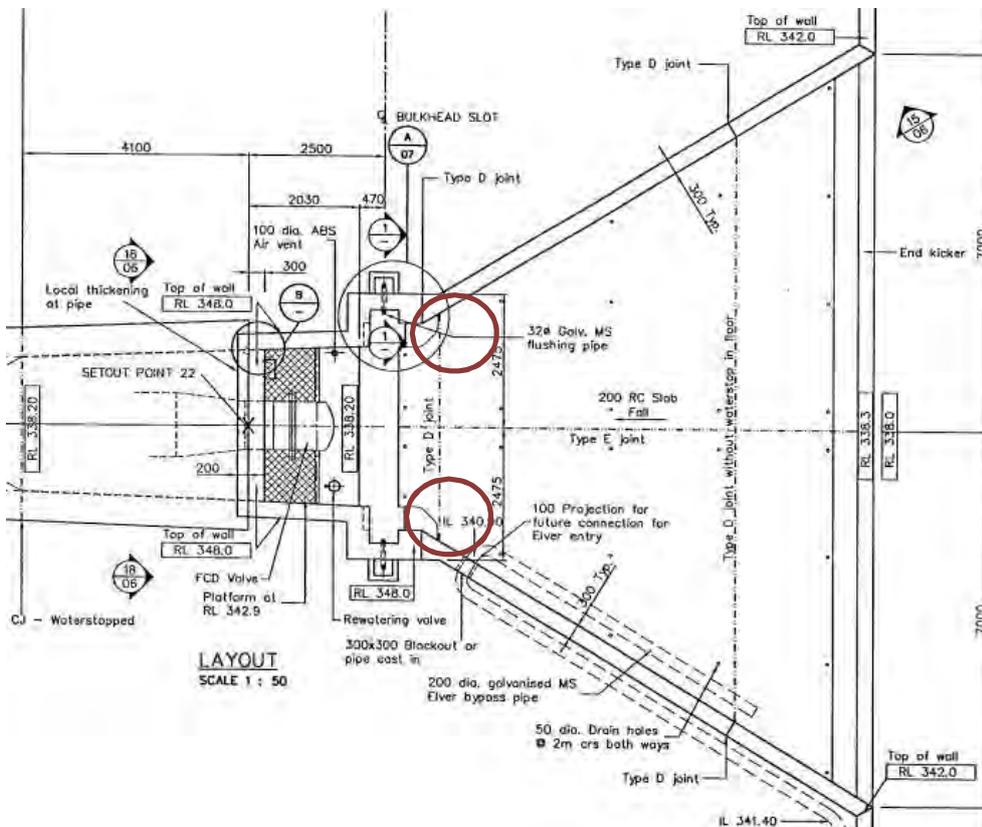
Excerpt from As-built Drawing 13897-5-S05 showing draft tube outlet and tailbay areas of observed damage (circled in red)
